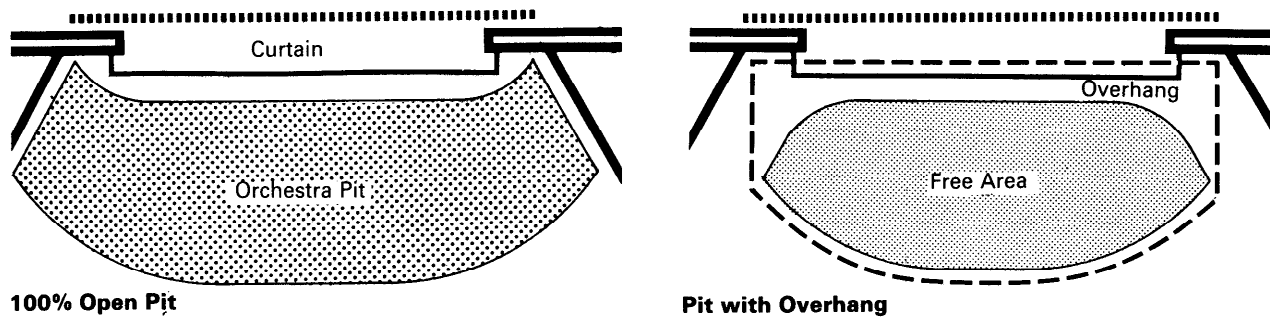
ORCHESTRA PIT PLAN
